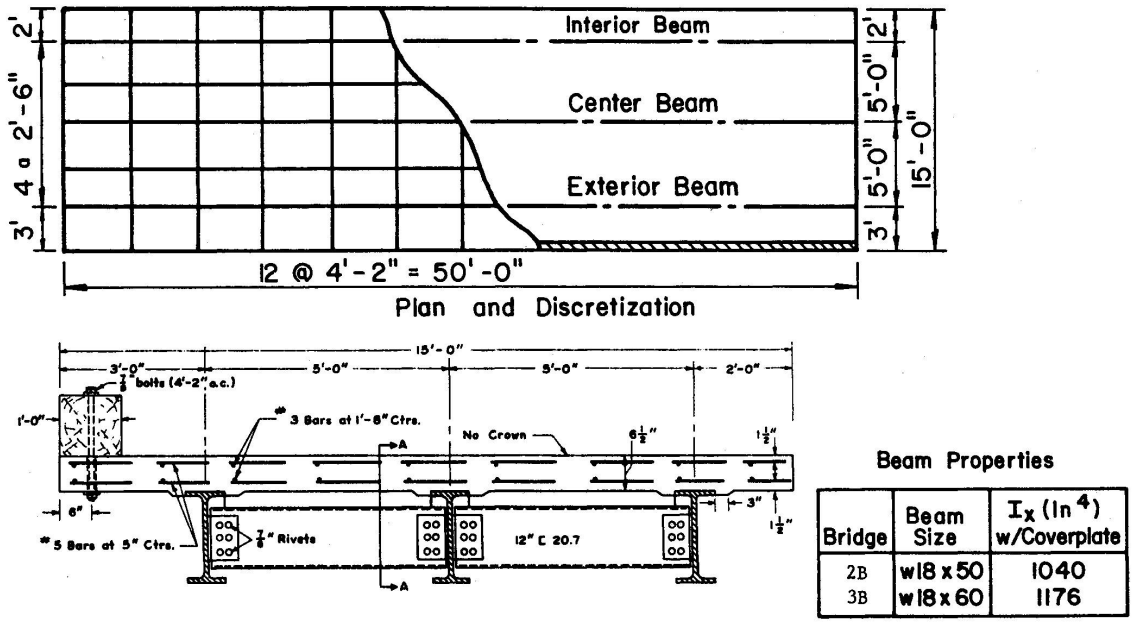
Test Bridge; Left Beam = Exterior Beam, Right Beam = Interior Beam (Ref. 4)
